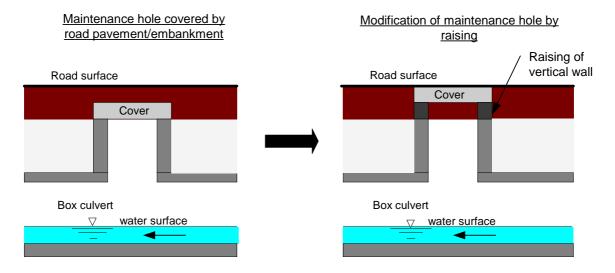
Modification of Closed Maintenance Hole due to Road Pavement
